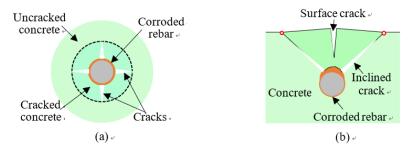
Two typical configurations for studying deterioration of concrete cover caused by corroded inner rebar (a) concrete cover specimen, and (b) cover and core specimen
